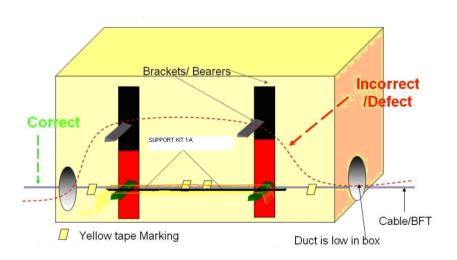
Duct is low in box bottom bore. Bracket & bearers are not useable (too short), change bearer for longer version and support with new brackets fitted lower down. Then support with relevant Support Bar or Joint Kit Support 1A. Dotted line shows cable/BFT/Sub-duct (less than 25mm) bent to go on supports, which is incorrect.
